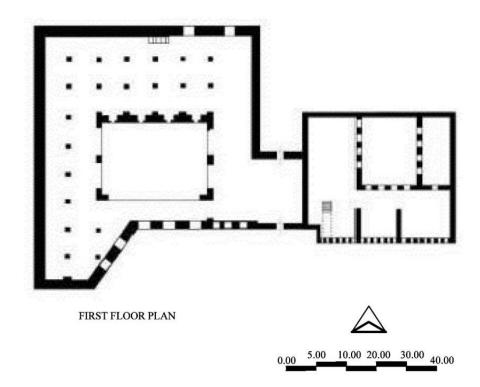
The first floor plan of Sayınlar Soap Factory, Nizip (Source: Eker, 2006)
